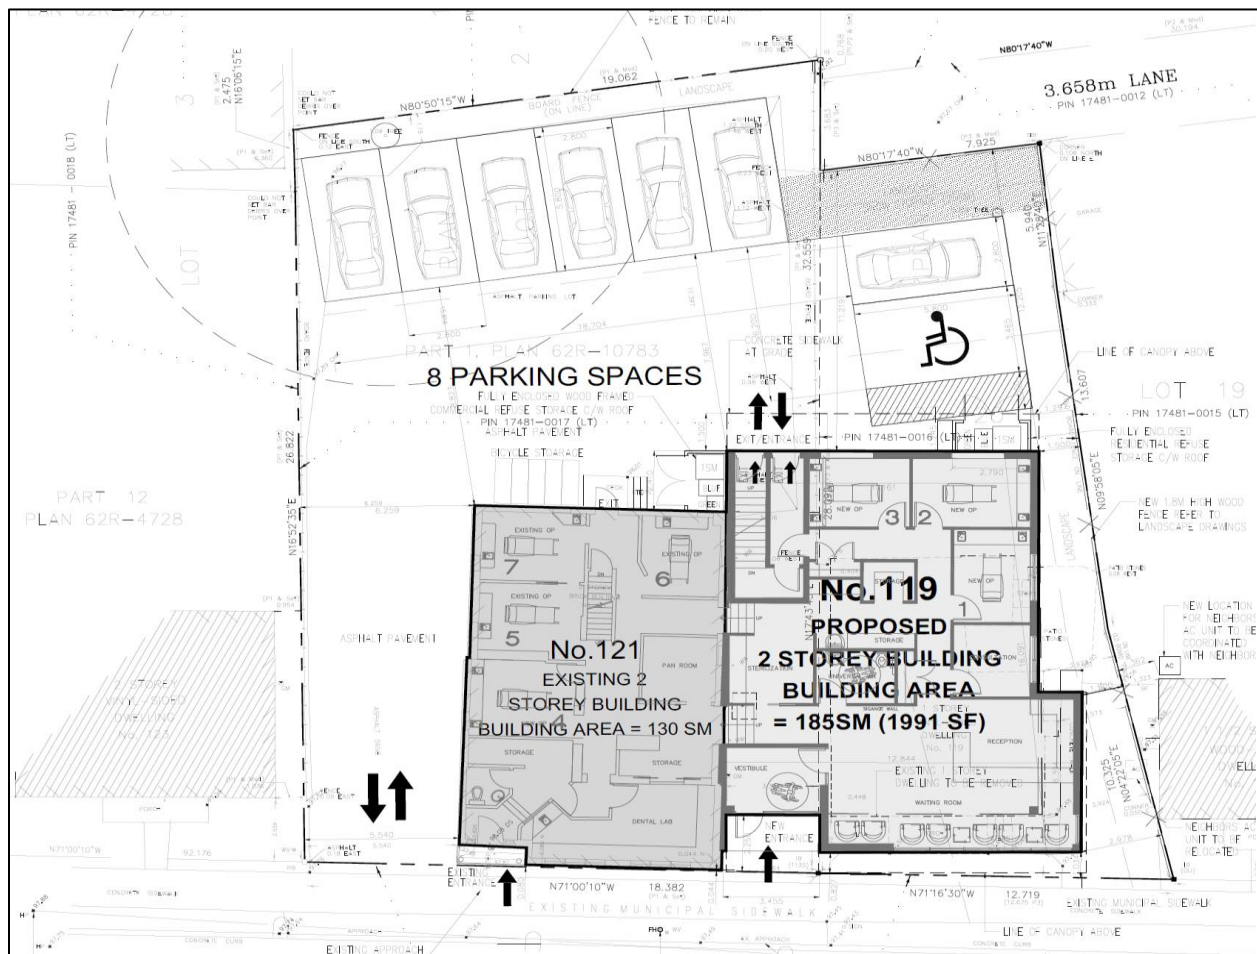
FIGURE ONE: CONDITIONALLY APPROVED SITE PLAN
